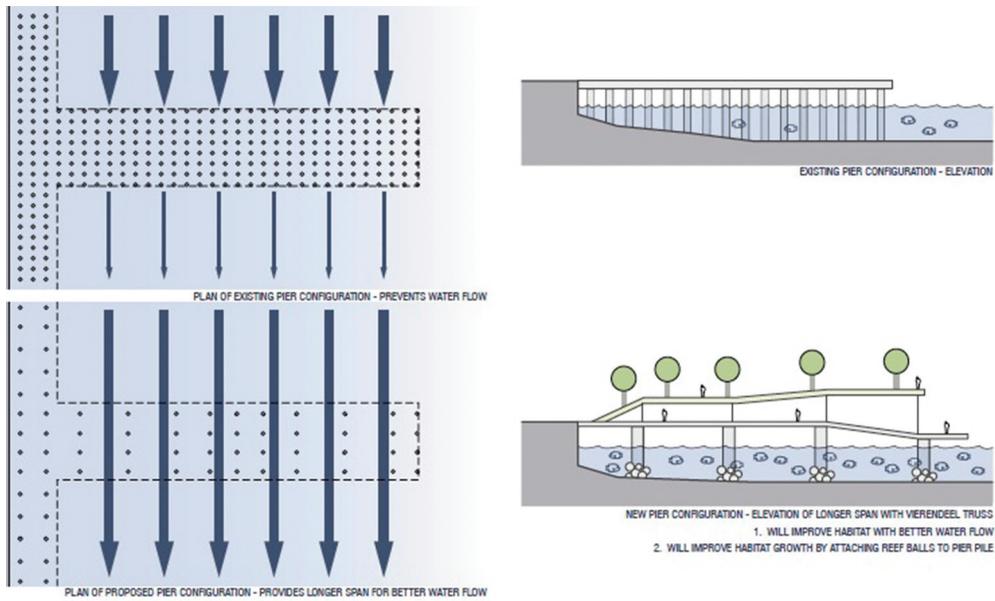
Existing and new pier configuration (Feeney and Piller 2011).
